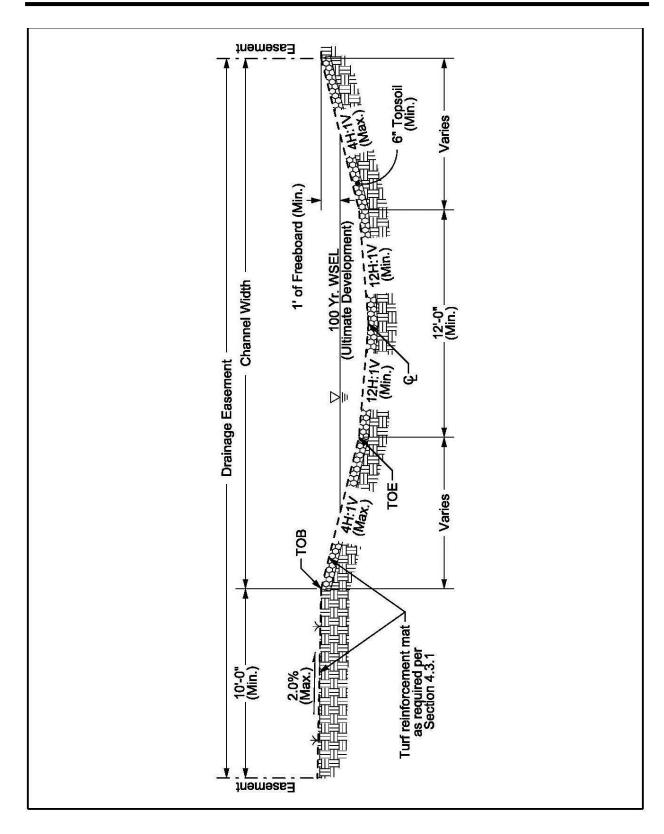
Typical Section – Trapezoidal Earthen Channel
